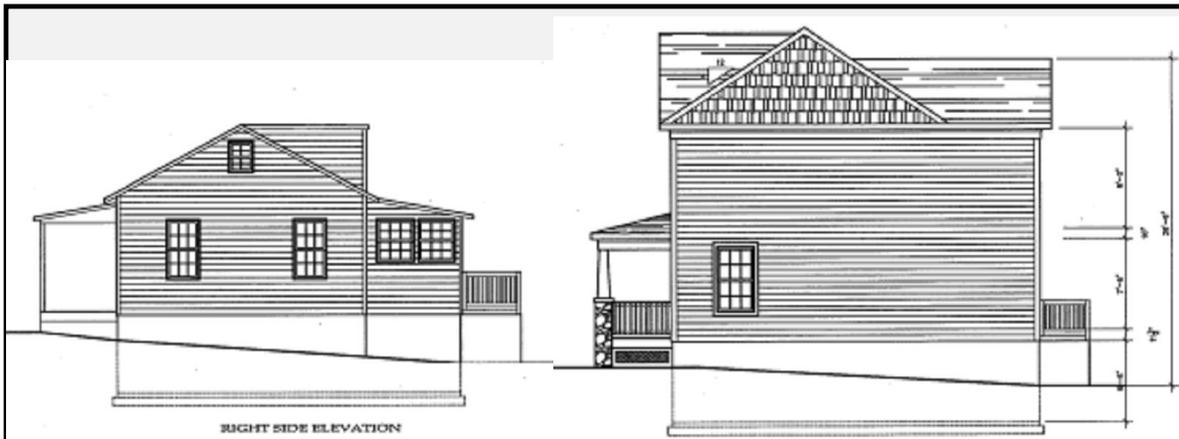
Side by side comparison, north side elevation existing and proposed. Source: Applicant.
